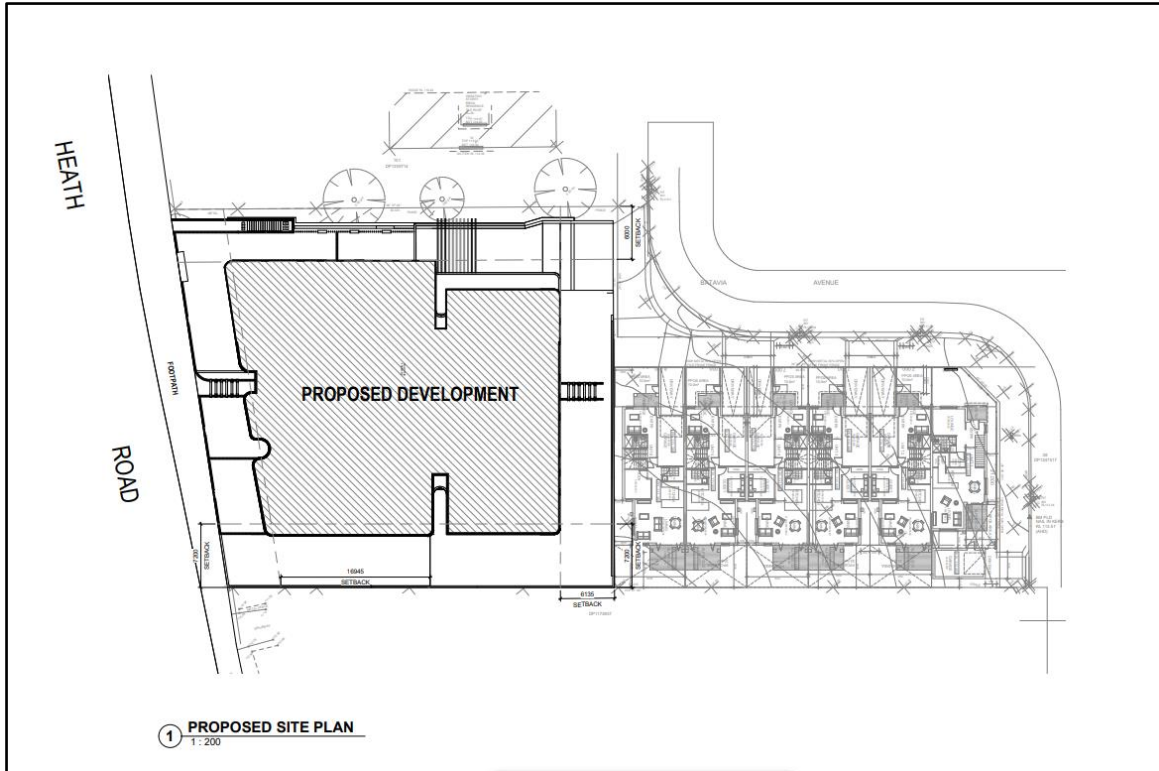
Proposed site plan (the development is contained to the portion of the site fronting Heath Road with six attached dwellings currently under construction on the smaller portion of the site fronting Batavia Avenue)
